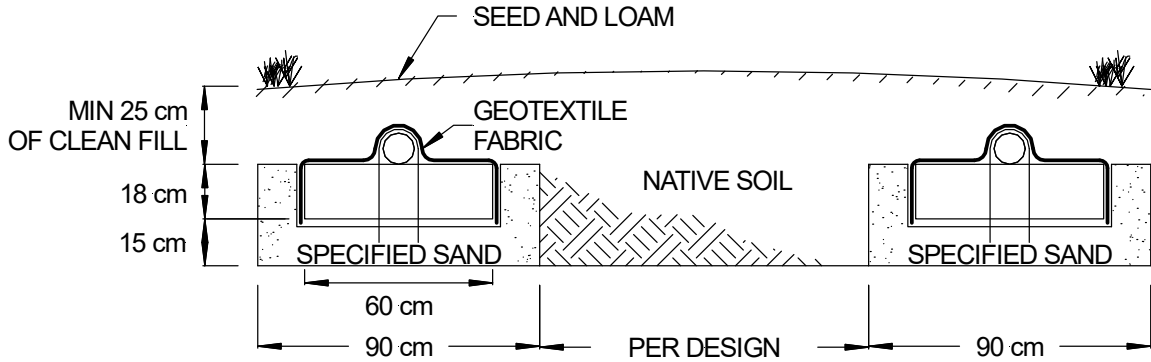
SECTION VIEW – TRENCH SYSTEM – SLOPING SITE
